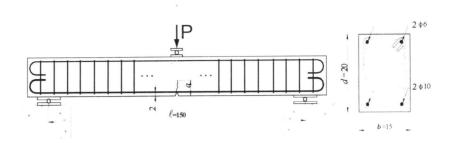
Three-point bend reinforced concrete beam specimen: loading and geometry
